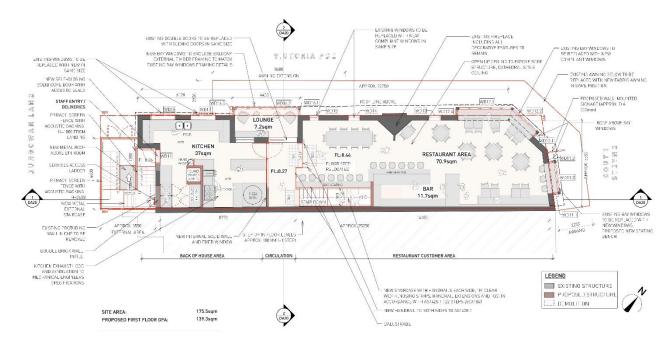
Proposed alterations and uses to the First Floor. See Drawing DA11
